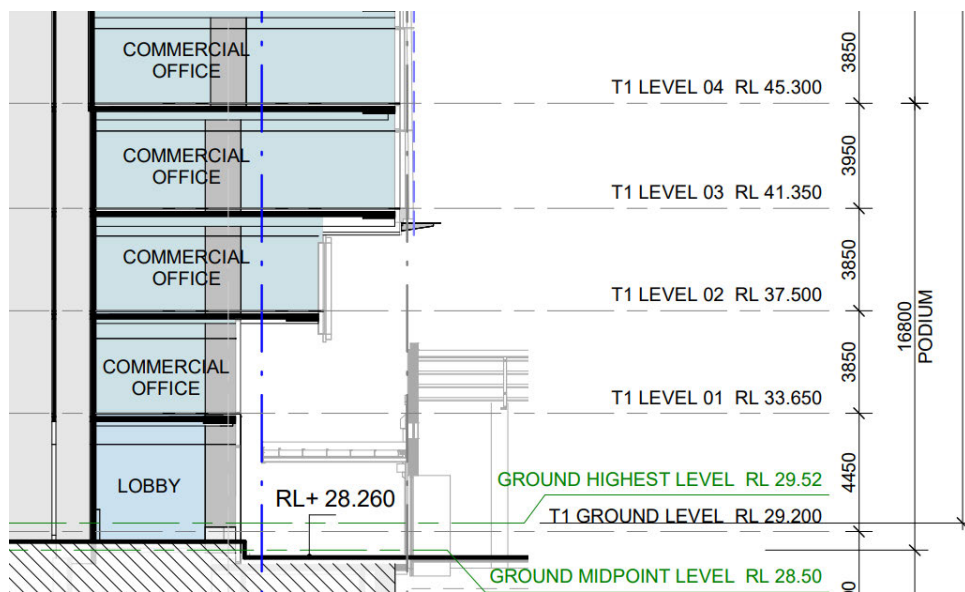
Section of Tower One looking west indicating the extent that the tower extends above the canopy of the Franklin Street Stores. (Source: Tower One architectural plans)
